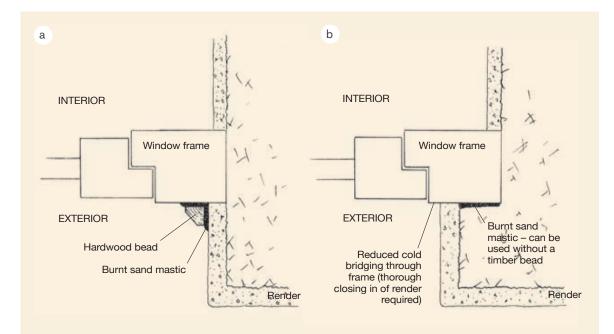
Plan views of window jamb. (a) A hardwood bead detail with burnt sand mastic provides a natural alternative to stainless-steel or PVC frame-seal beads. (b) Here the bead has been designed out by extending the hempcrete over the window frame.
